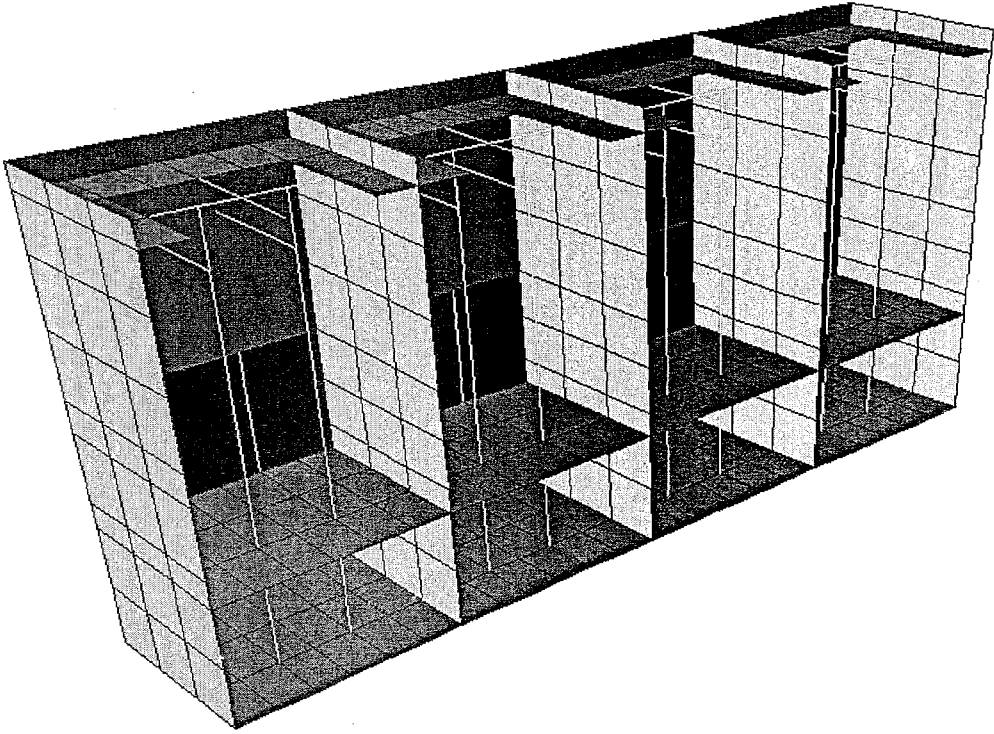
3-D Cross-Section of the Cooling Water Pump Facility
